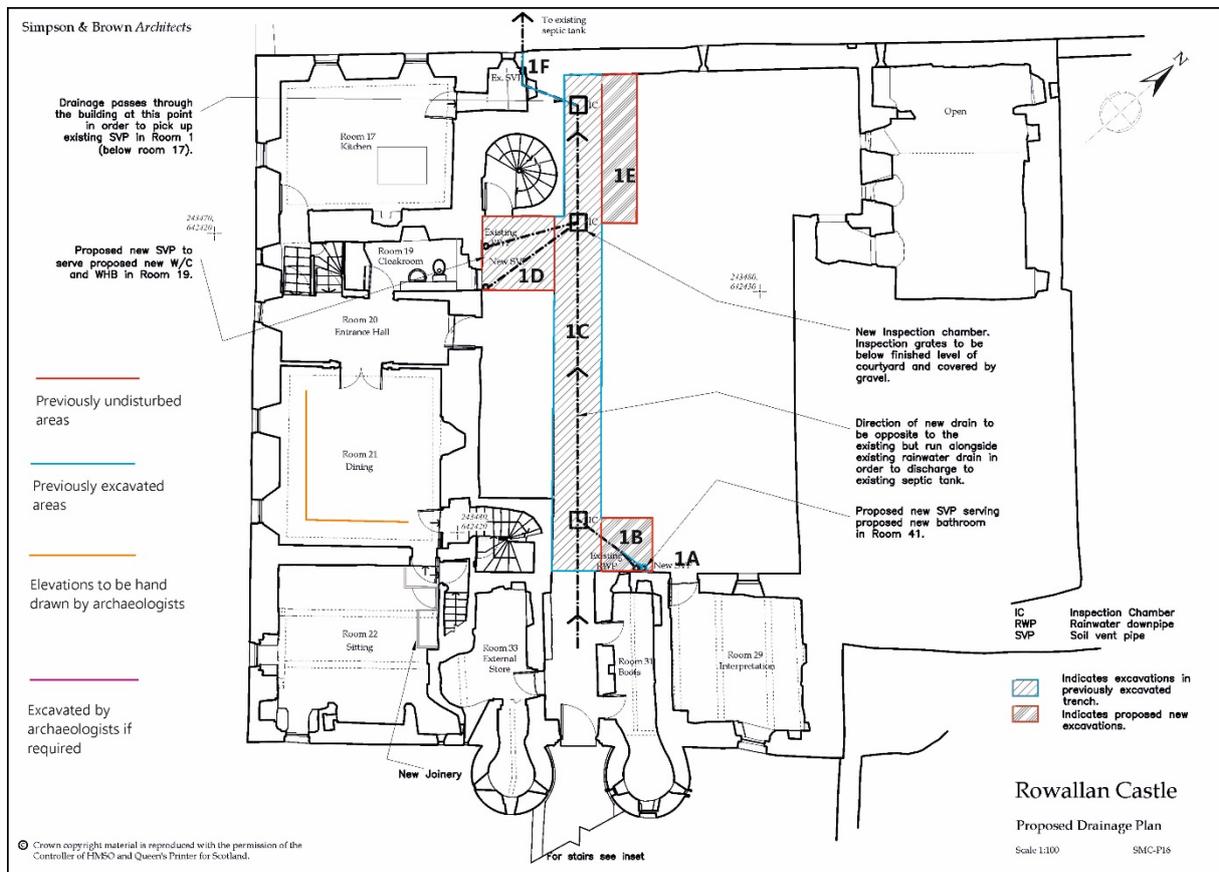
Site plan showing areas of excavated and monitored trenches (base plan provided by Simpson and Brown)
